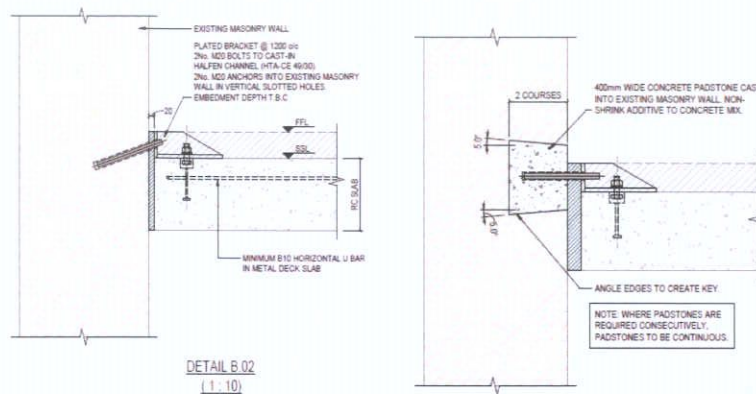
Typical Permanent Façade Restraint Fixing (RC Frame)
